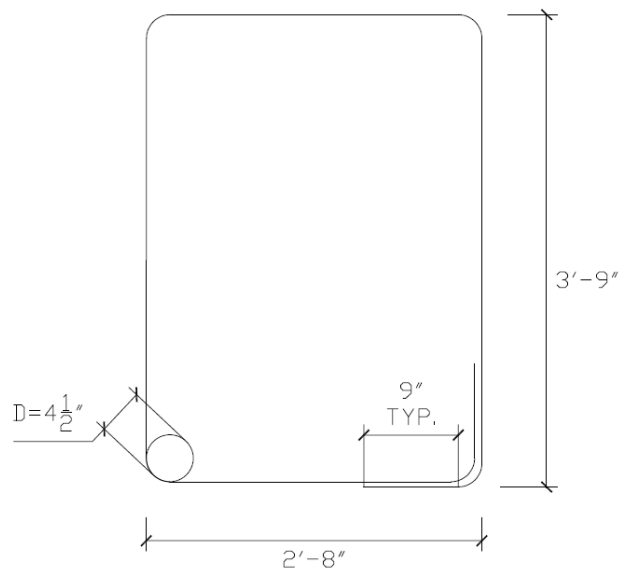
Dimensions of stirrups for Specimens 12 and 13
